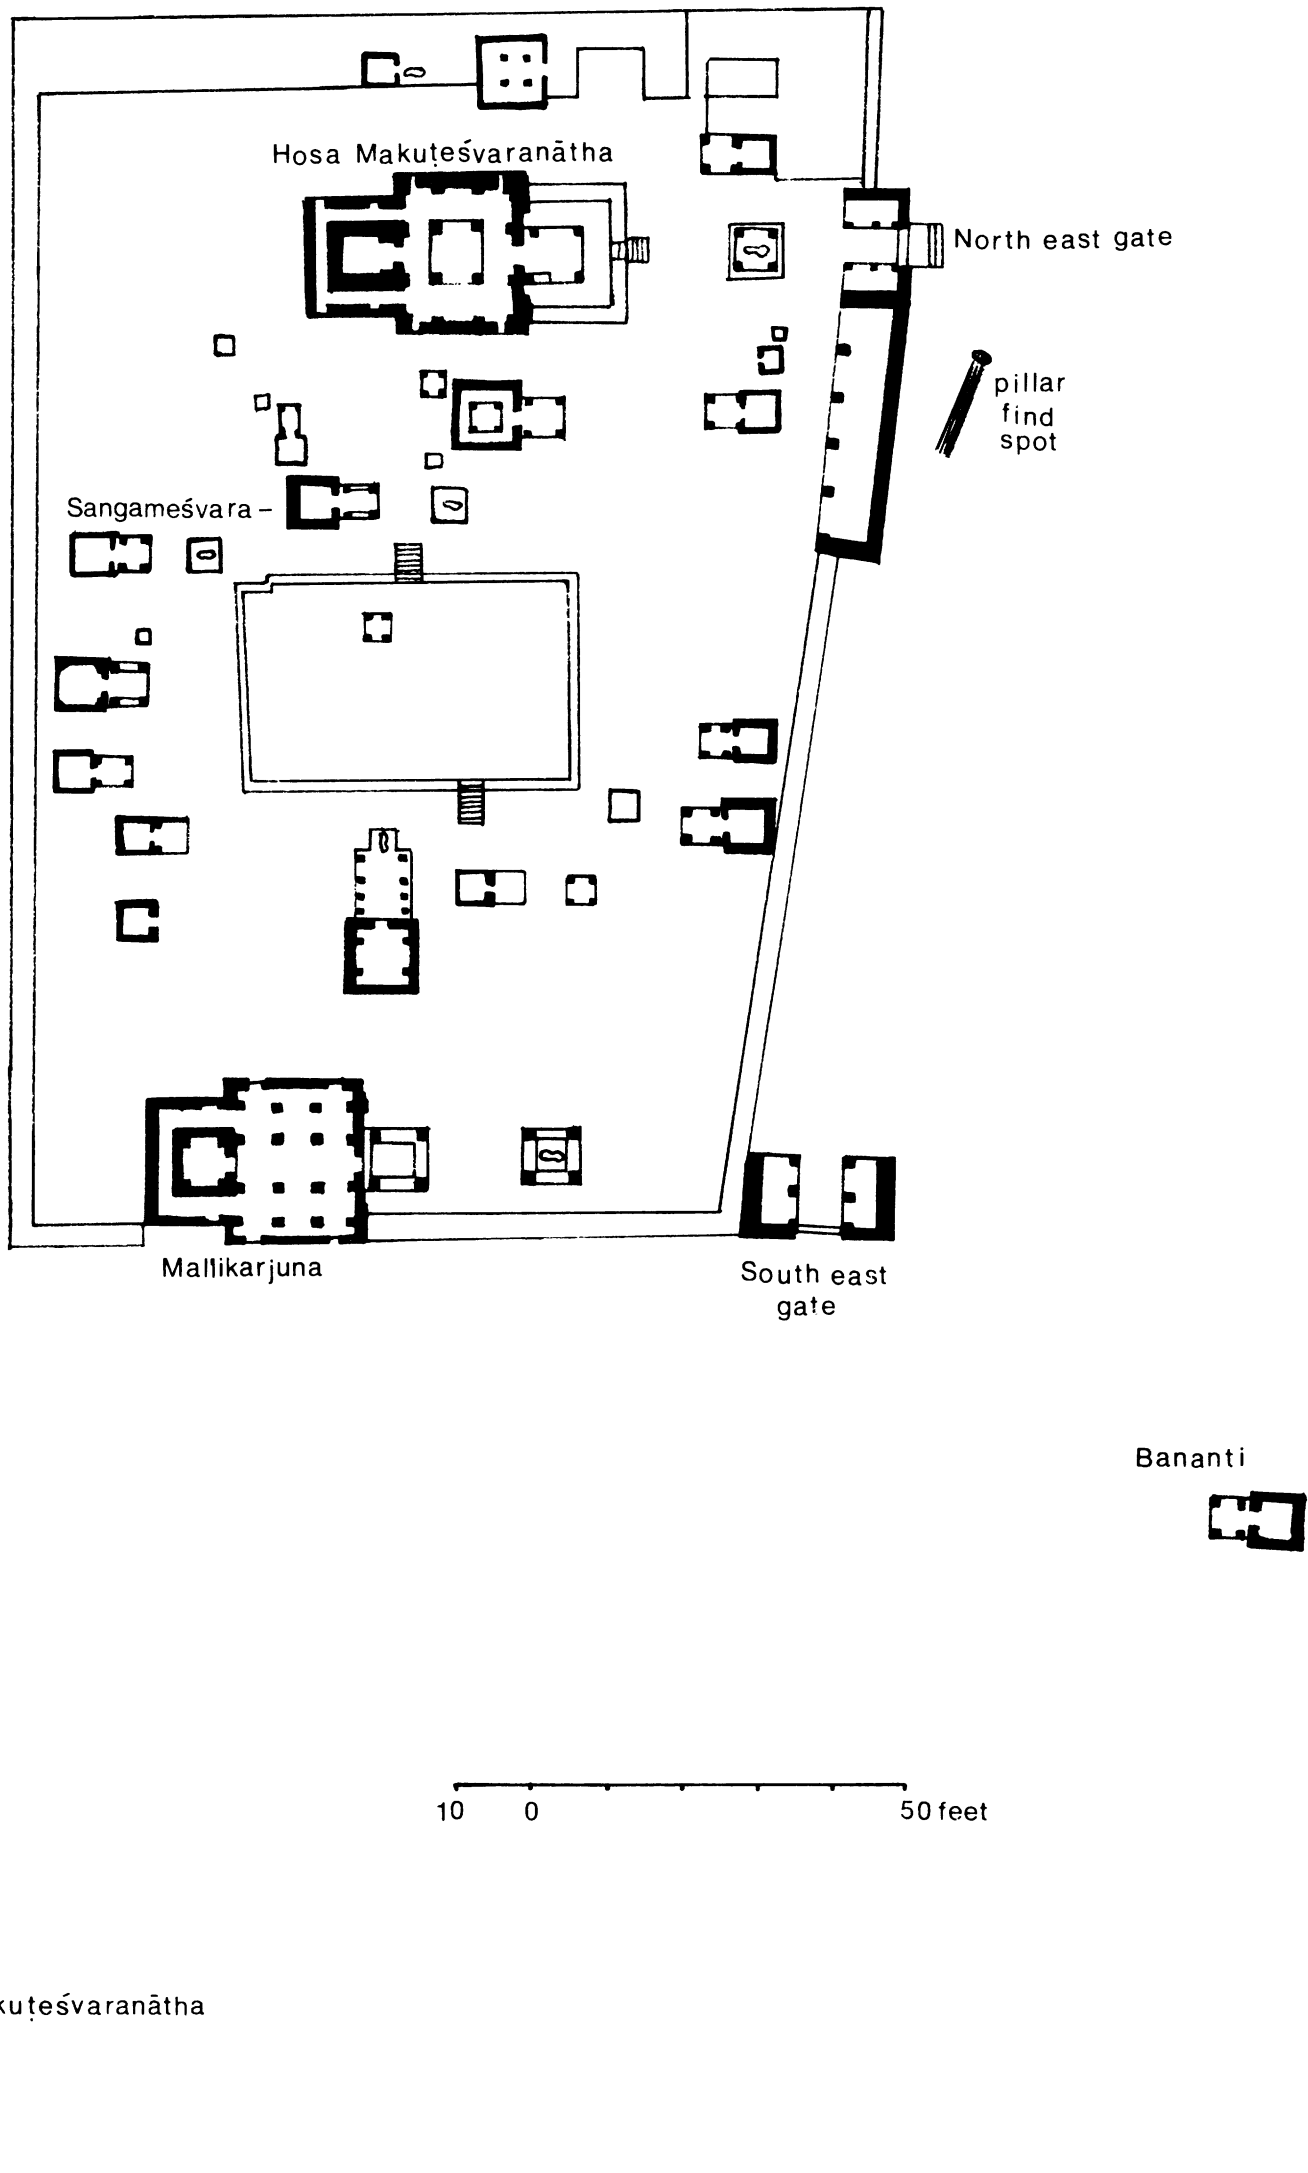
Makuṭa Site Plan (adapted from Cousens Plate 27)
